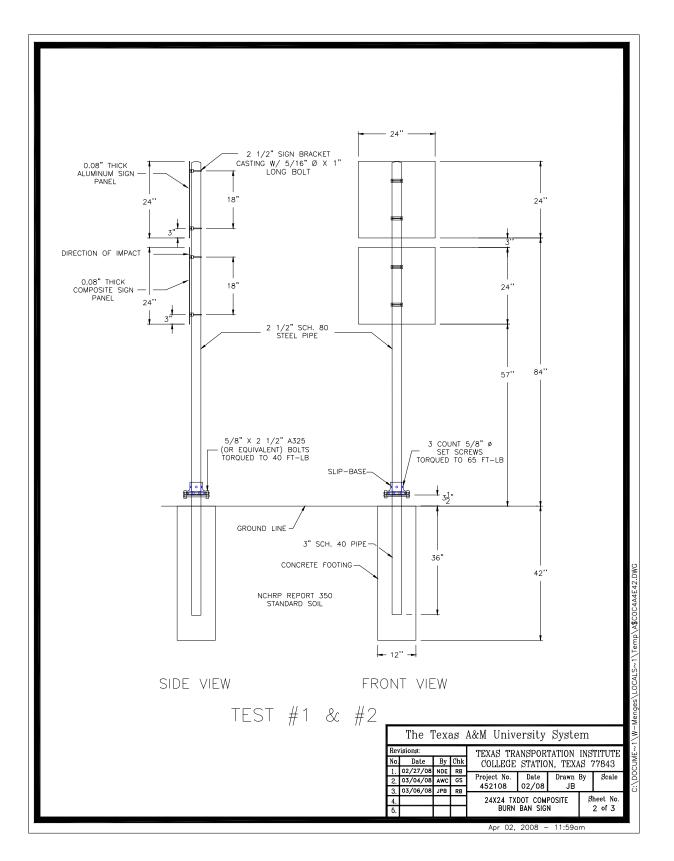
Details of the TxDOT 24 inch × 24 inch Burn Ban Sign Installation.
